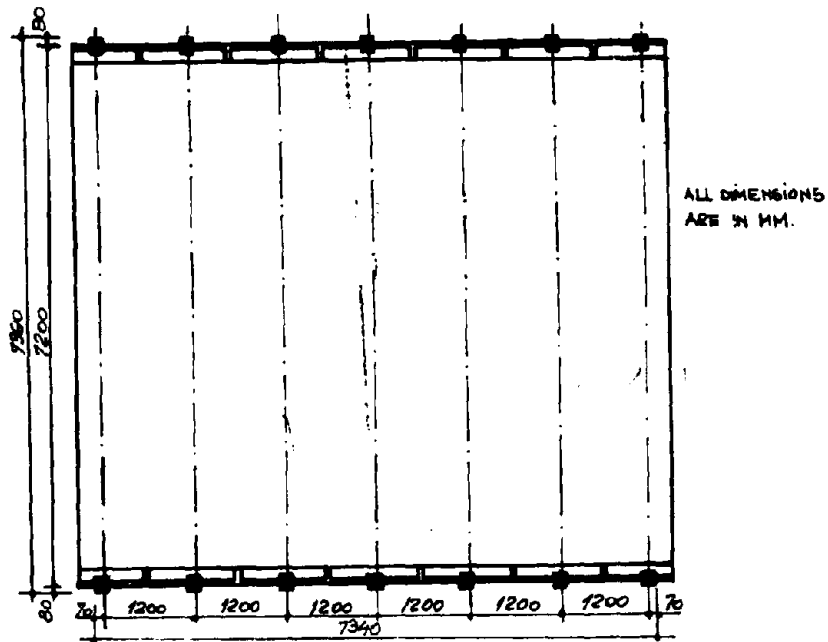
FULLY PRECAST FOUR STORY STRUCTURED MODEL
